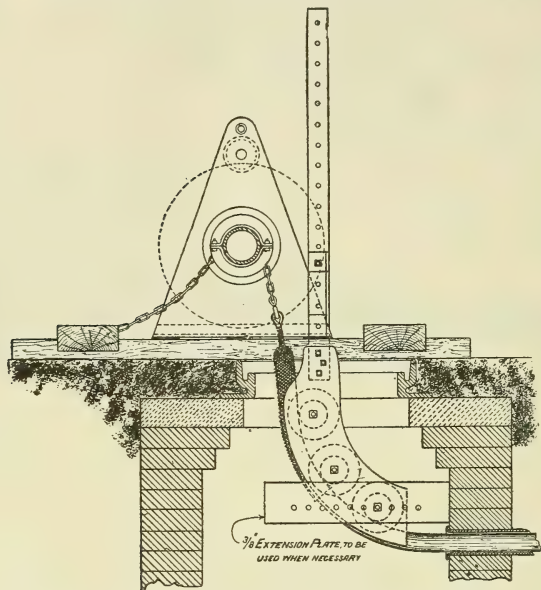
Winch and Cable Guide, Side View (Scale $\frac{1}{2}$)
